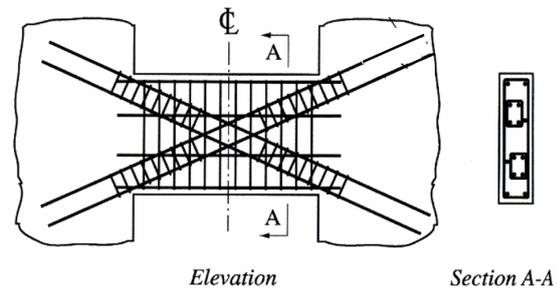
Schematic of reinforcement in coupling beams [from ACI318M, 2002]
